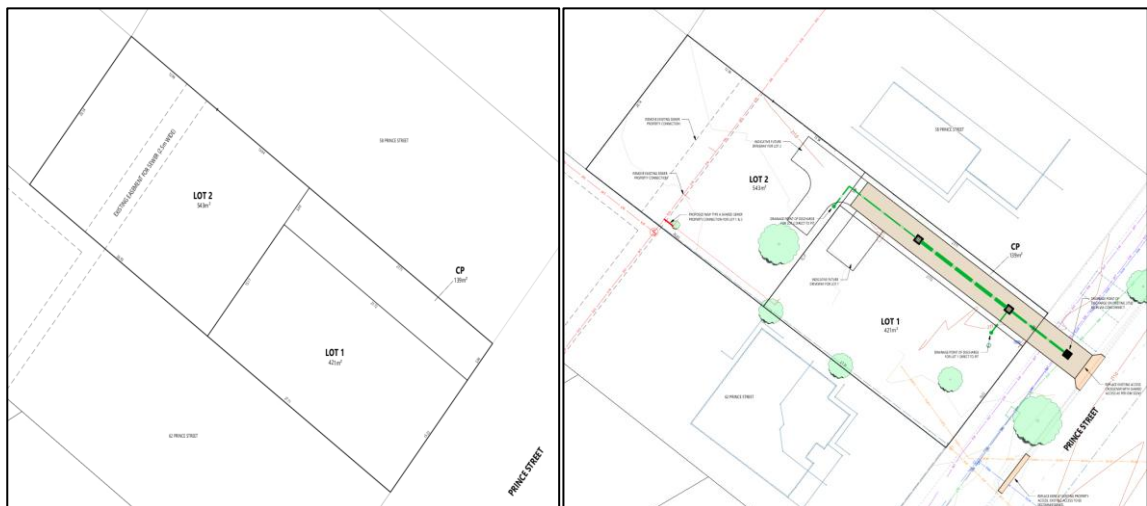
Shows the proposed subdivision plan (Left) and the development concept, with altered crossover (Right)
